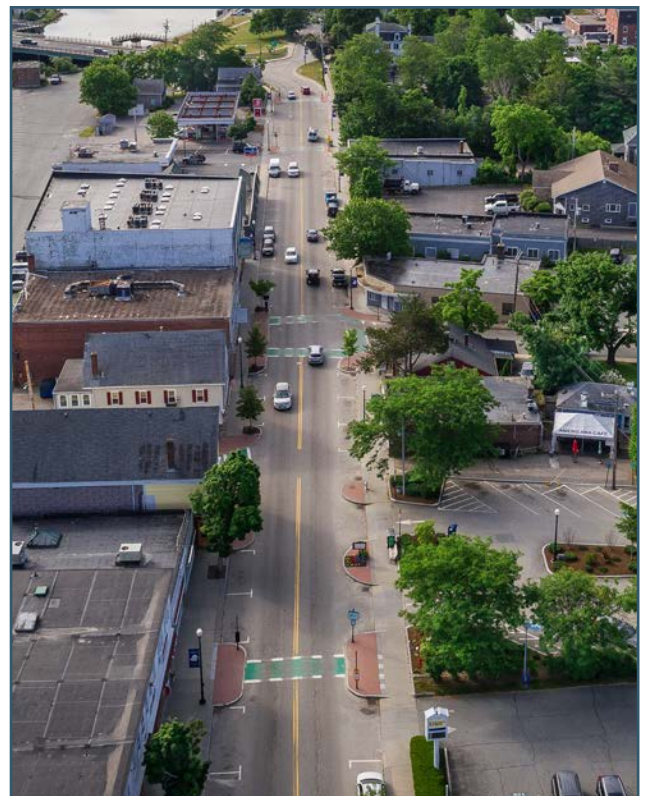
Bumpouts provide traffic calming and protection for pedestrians crossing Main Street in Wareham Village.
